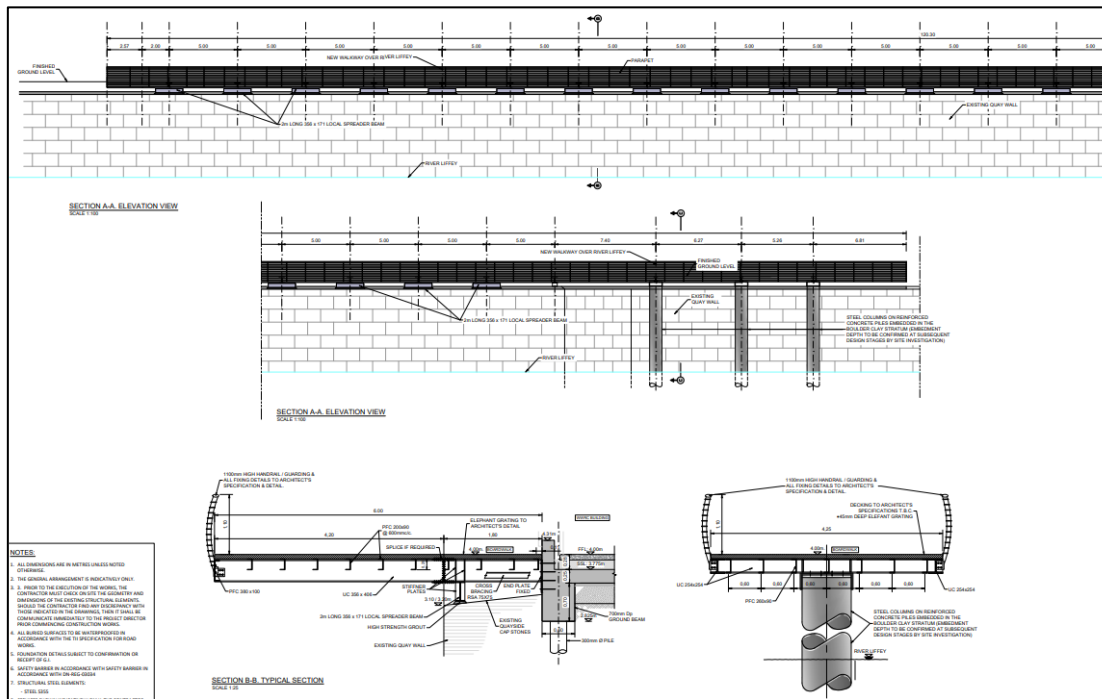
Elevation and sections of proposed boardwalk structure at Area B.
